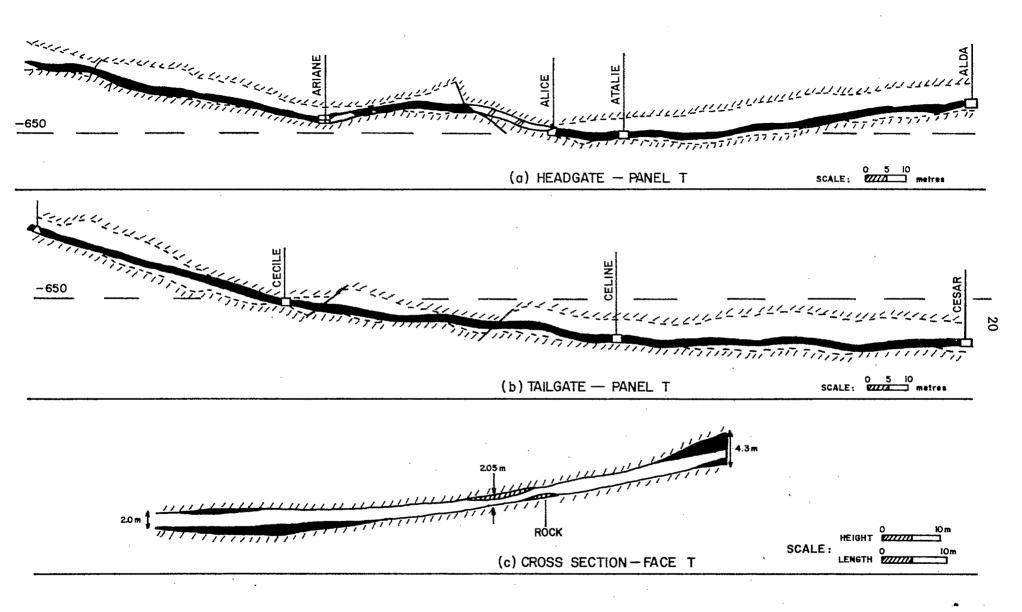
CROSS SECTIONS through HEADGATE, TAILGATE and FACE of PANEL T
